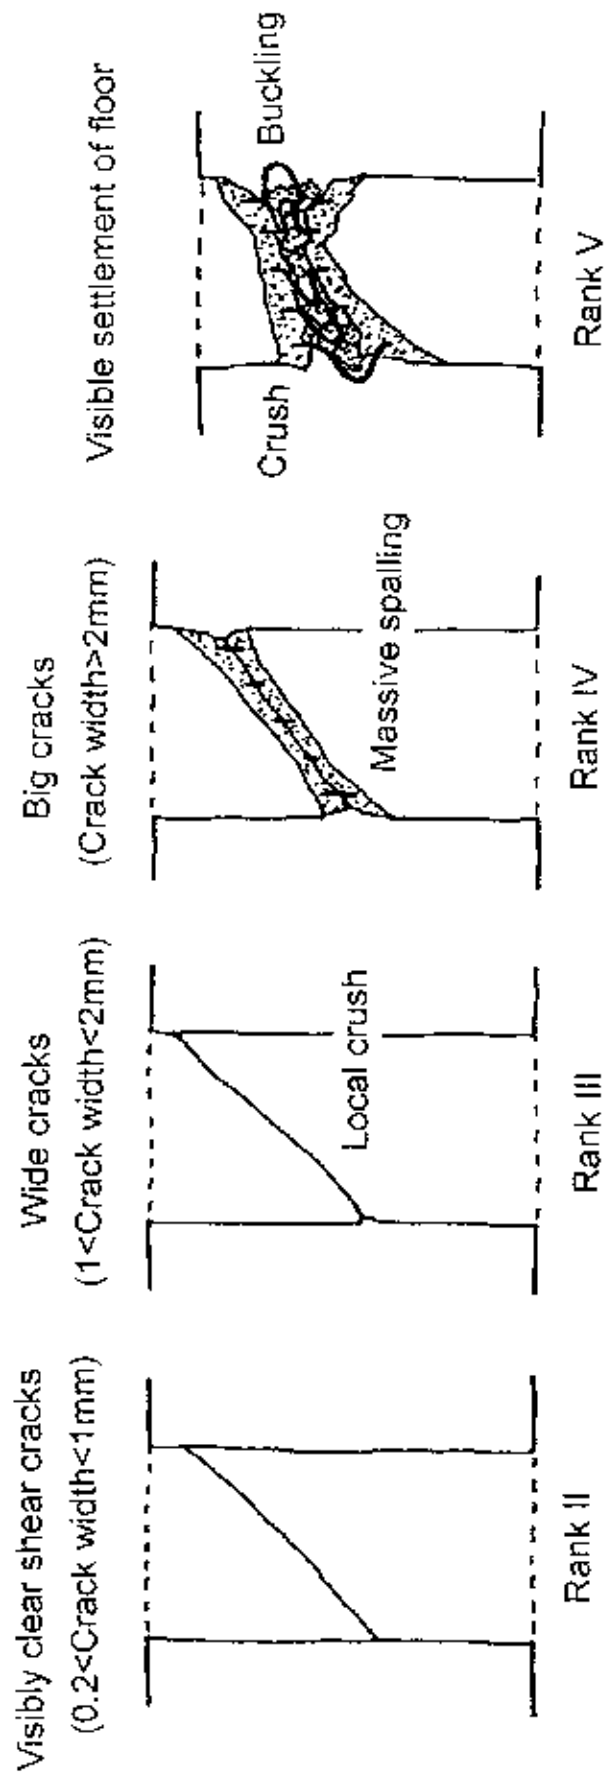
Damage Rank of Columns (Column Width > 40cm)
